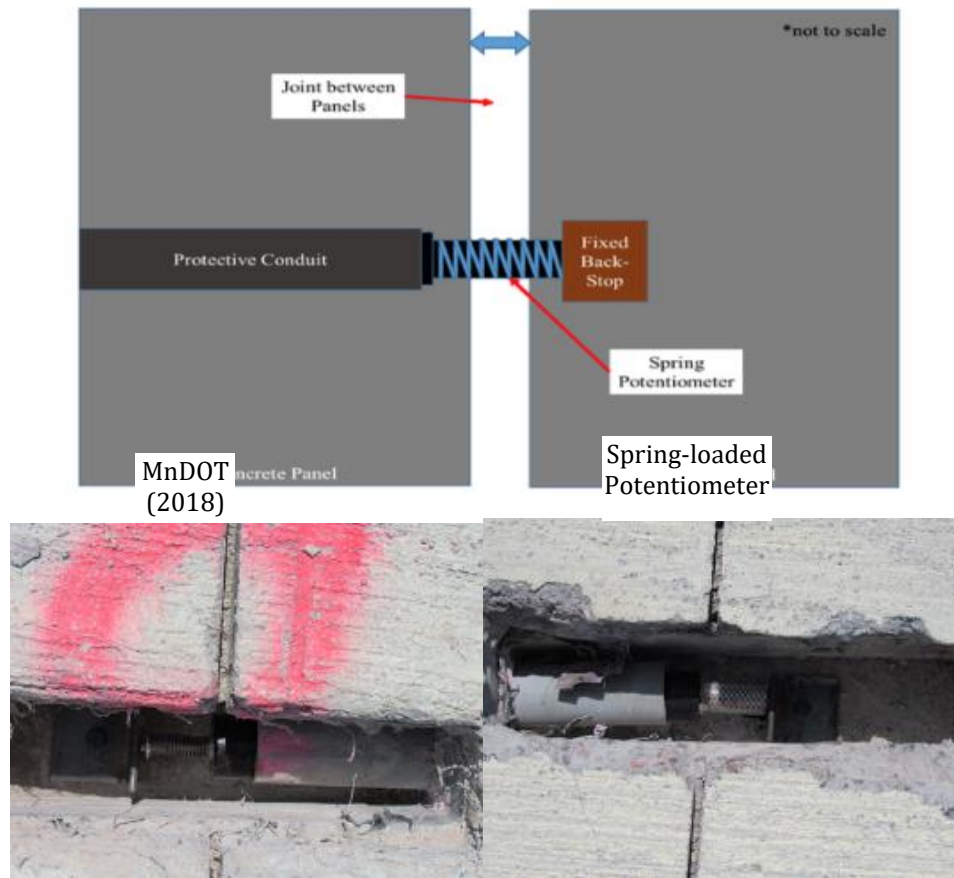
Sketch and photographs of joint opening sensors before installation of protective covering.
